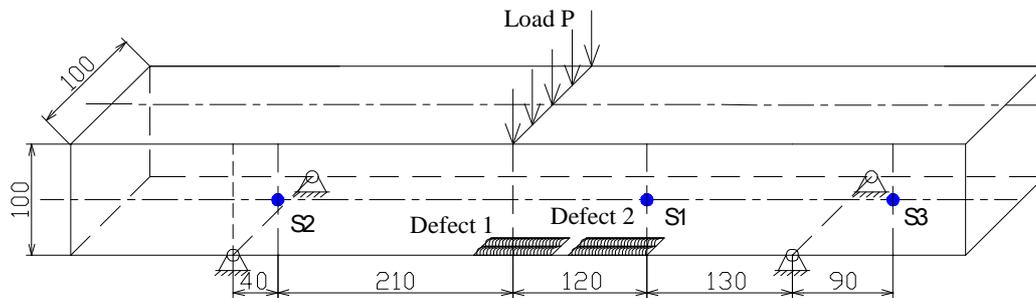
Dimension and sensors arrangement of the specimen (mm)
